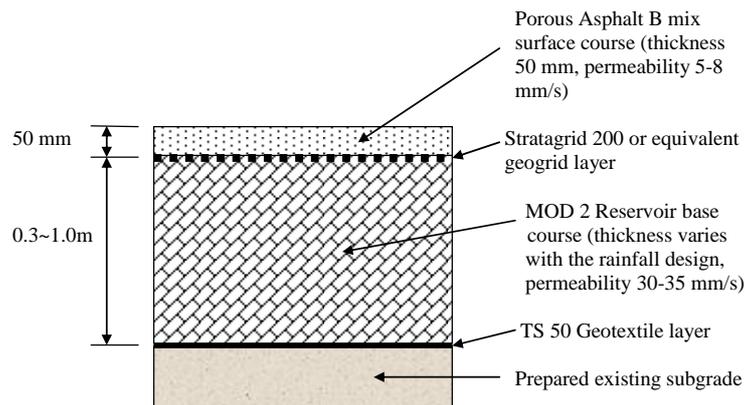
Cross section of the Designed Porous Asphalt Pavement
